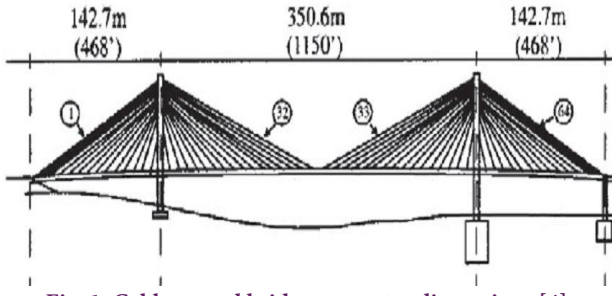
Cable-stayed bridge geometry dimensions [4]
